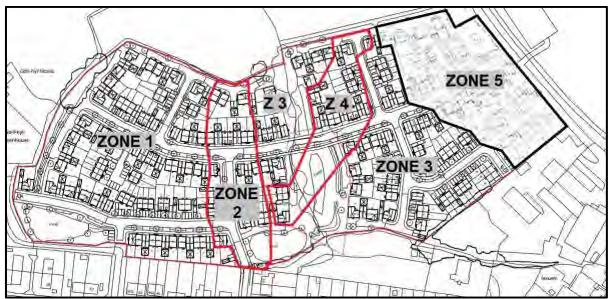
Foundation Zones and Proposed Layout (Not to Scale)
